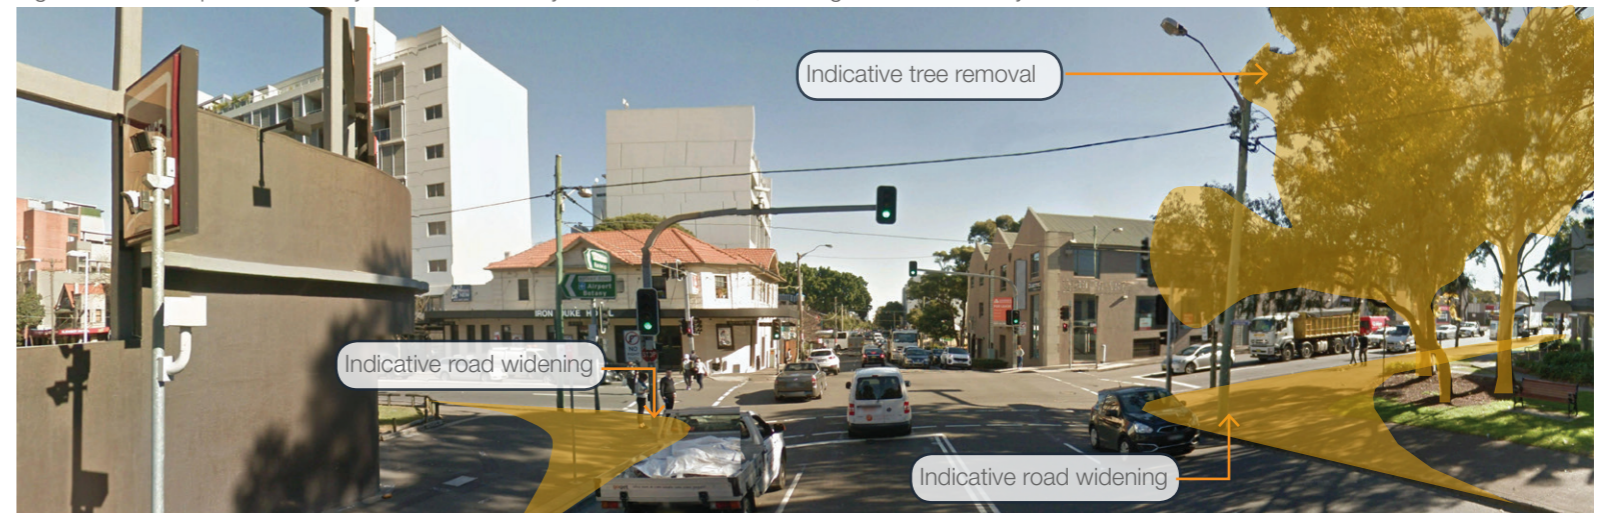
Viewpoint07: Botany Road and McEvoy Street intersection, looking west into McEvoy Street
